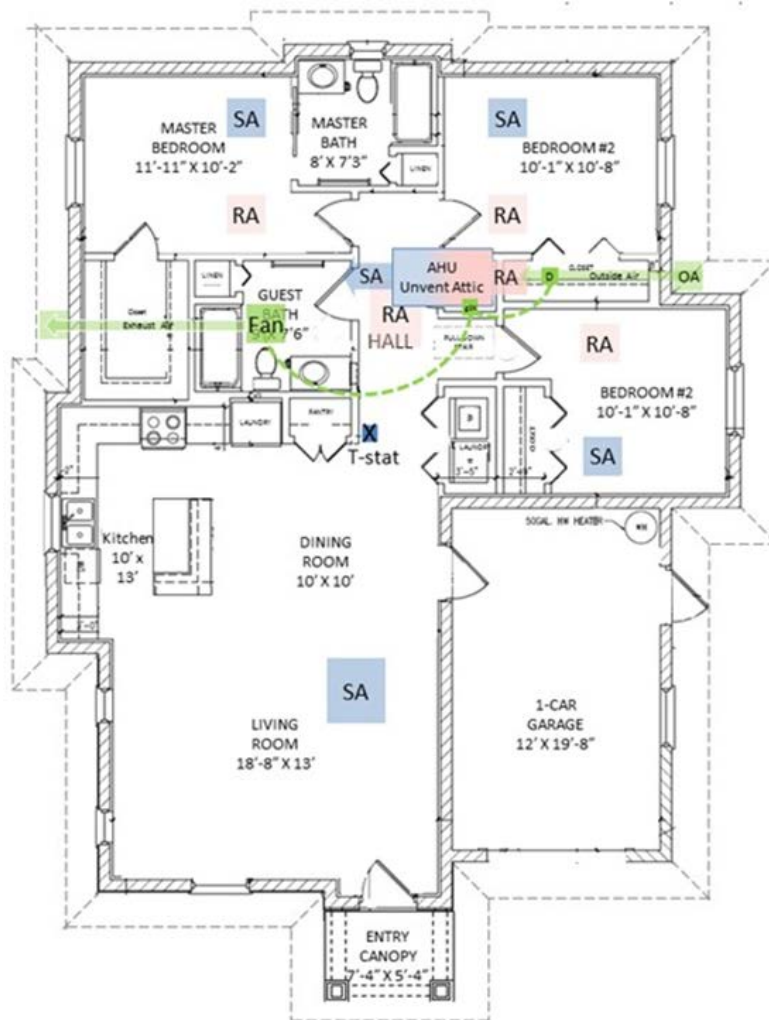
Floor plan with location of heating, ventilating, and air-conditioning components
